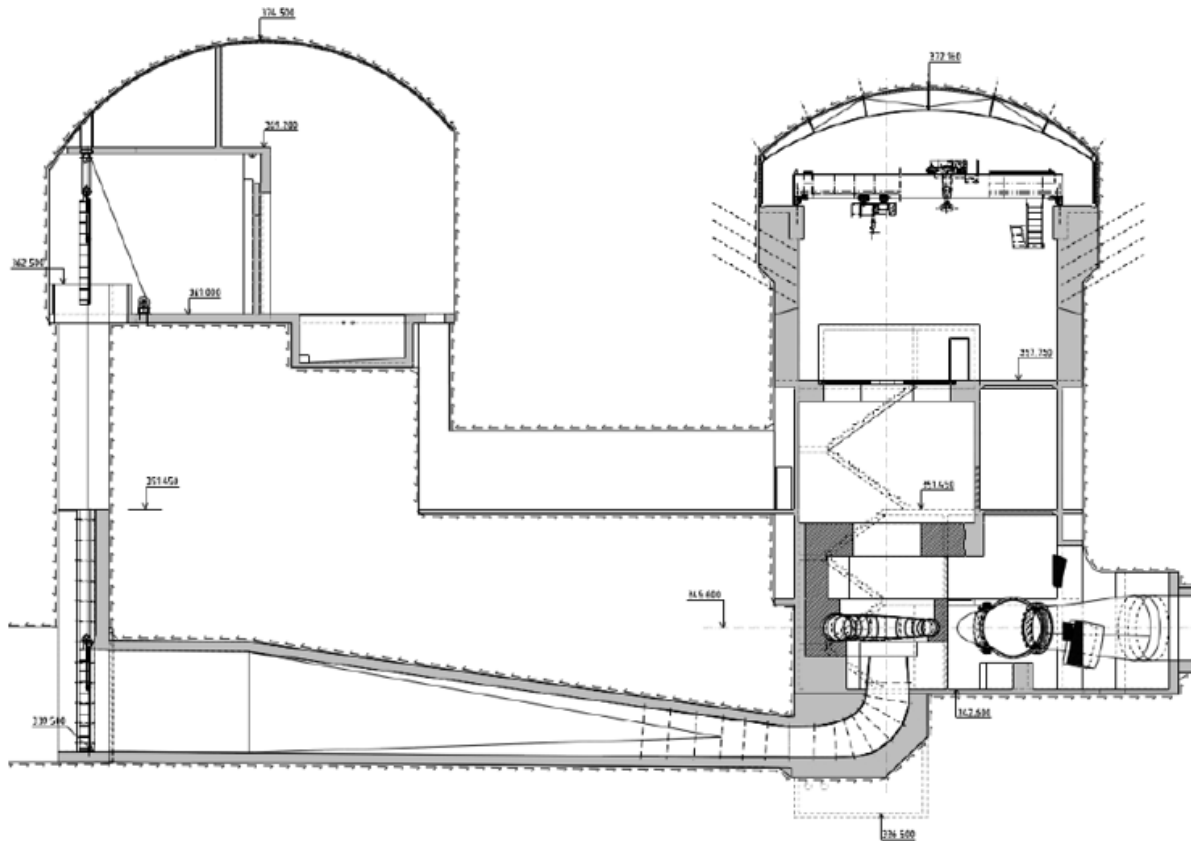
1: Cross section of the powerhouse cavern and transformer hall in the Moglicë power plant (Multiconsult, 2011).
